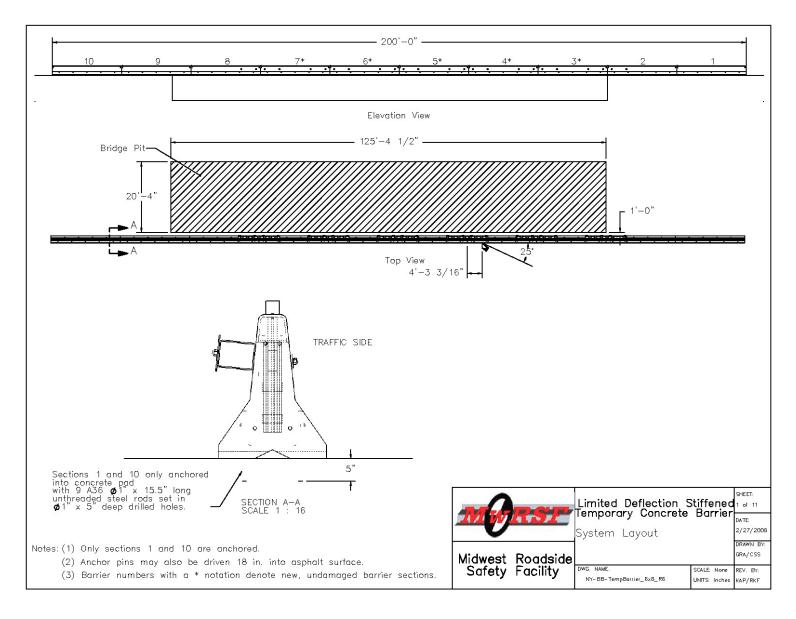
Stiffened Temporary Concrete Barrier System Layout (English), Test NYTCB-3
